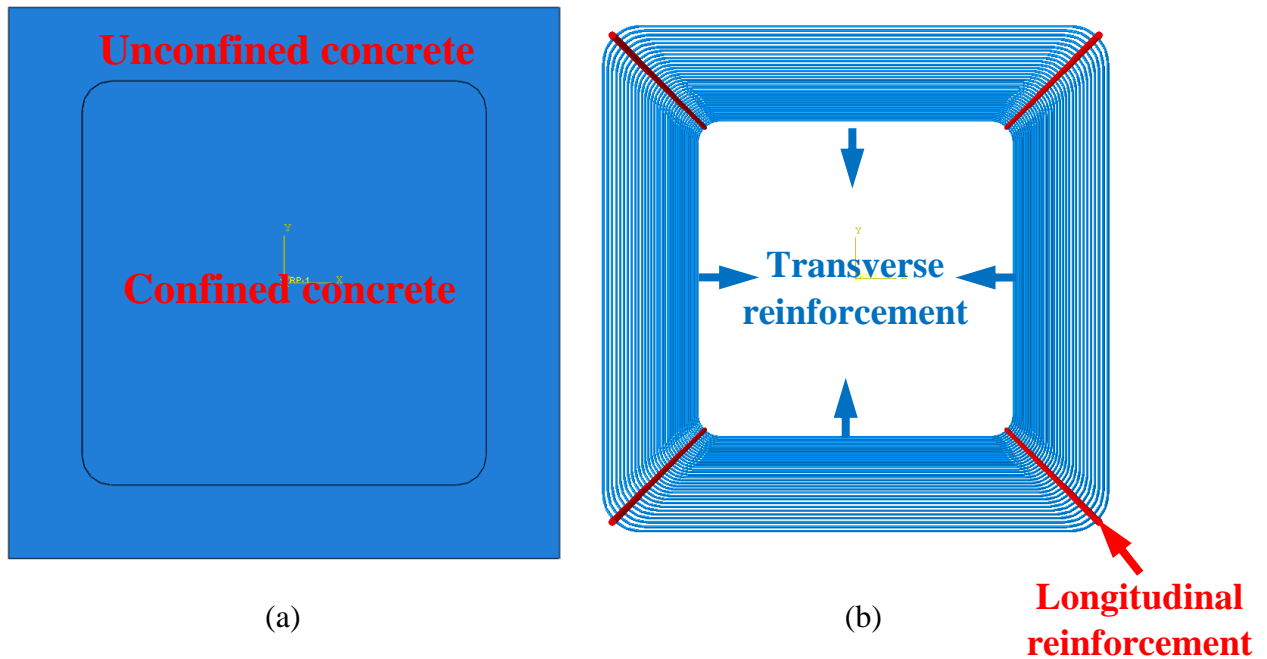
Finite element (FE) modelling of: (a) cross-section of UHPFRC slender columns: (b) longitudinal and transverse reinforcements
